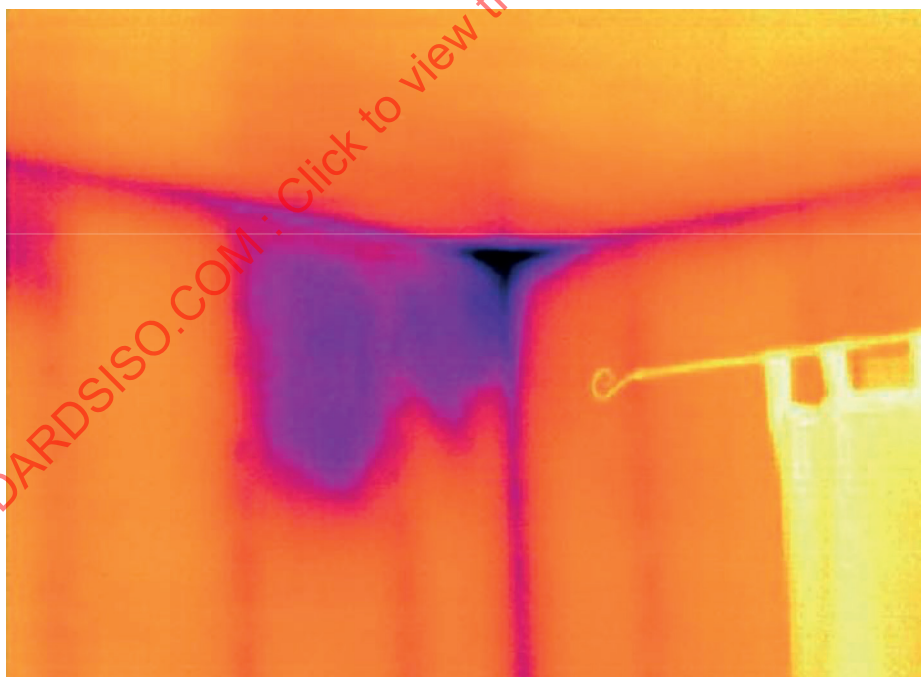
Wall — Insulated stud wall — Qualitative illustration of thermal insulation fault
